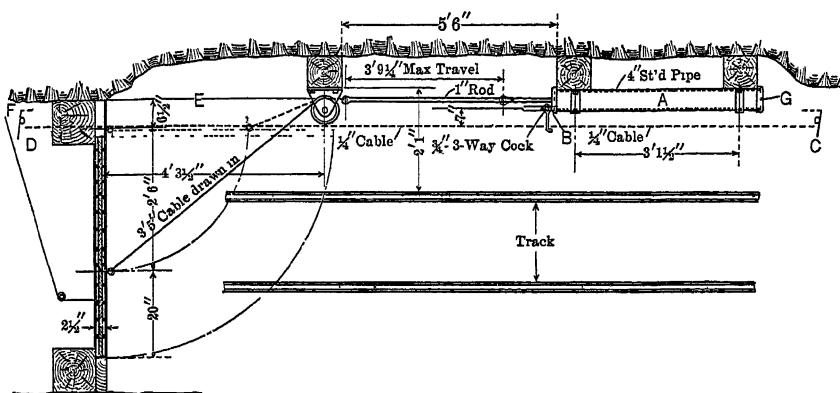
PLAN SHOWING AUTOMATIC DOOR ARRANGEMENT.
